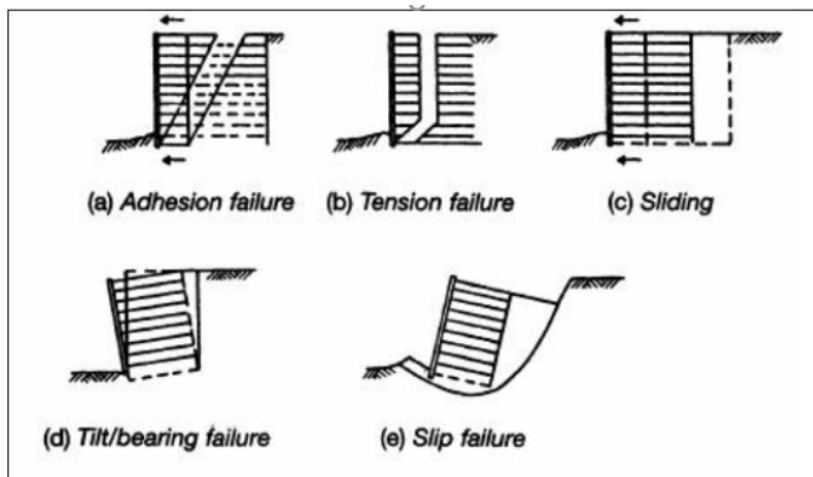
MSE Walls Typical Failure, adapted from (Bobet, 2002)
